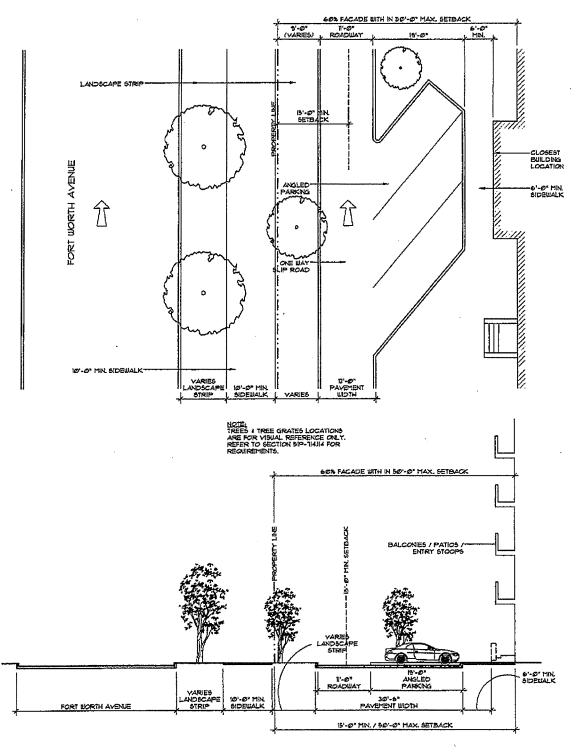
F - SUBDISTRICT 4A3 0 49 1 170958
